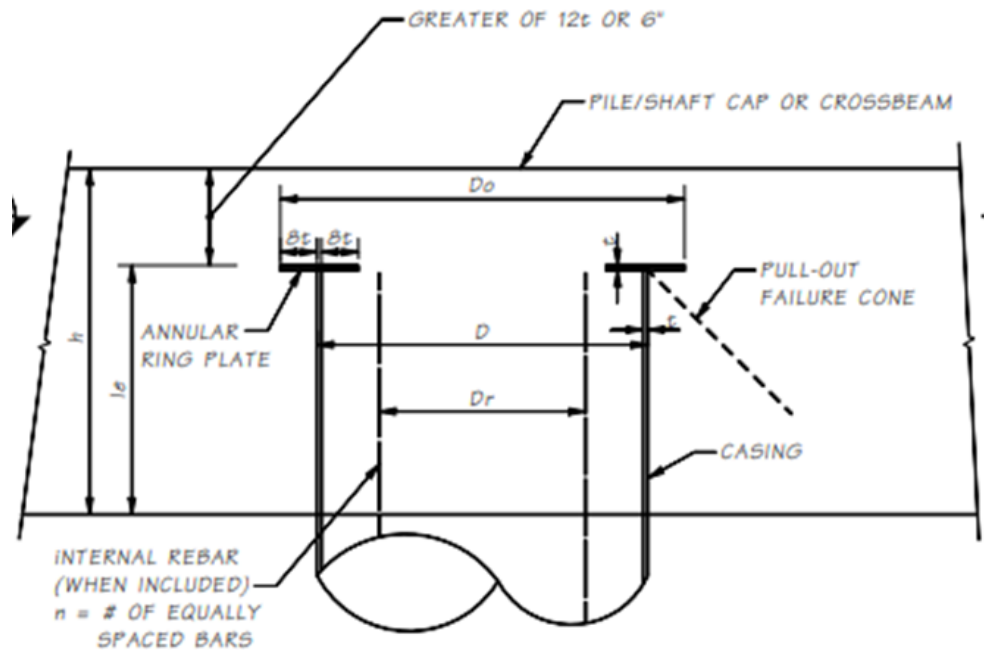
WSDOT Pipe Embedment Cross-Section
